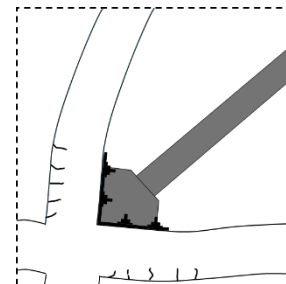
Steel haunches for local strengthening of beam-to-column reinforced concrete frame and effect of flexural deformation of beam and column on the force distribution on the anchorage [9]
